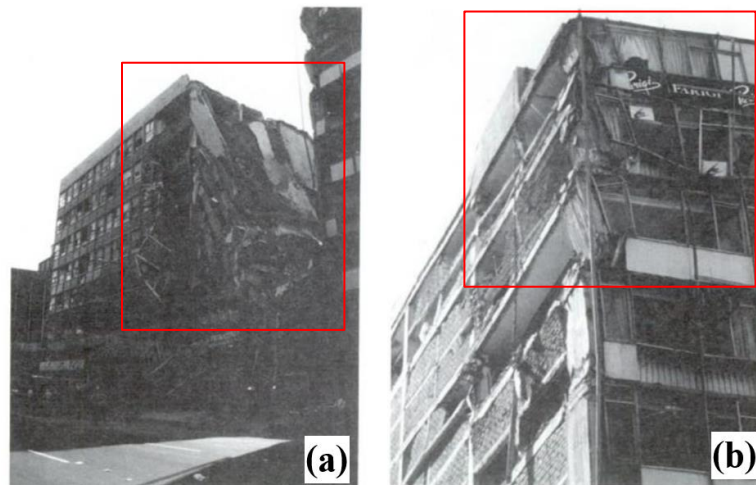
Typical pounding damage in similar height buildings: (a) seven-storey office building on Ave 20th de Novembre, which collapsed due to pounding; and (b) neighbouring nine-storey building showing impact damage to columns, adapted from the (National Bureau of Standards Building Science, 1987)
